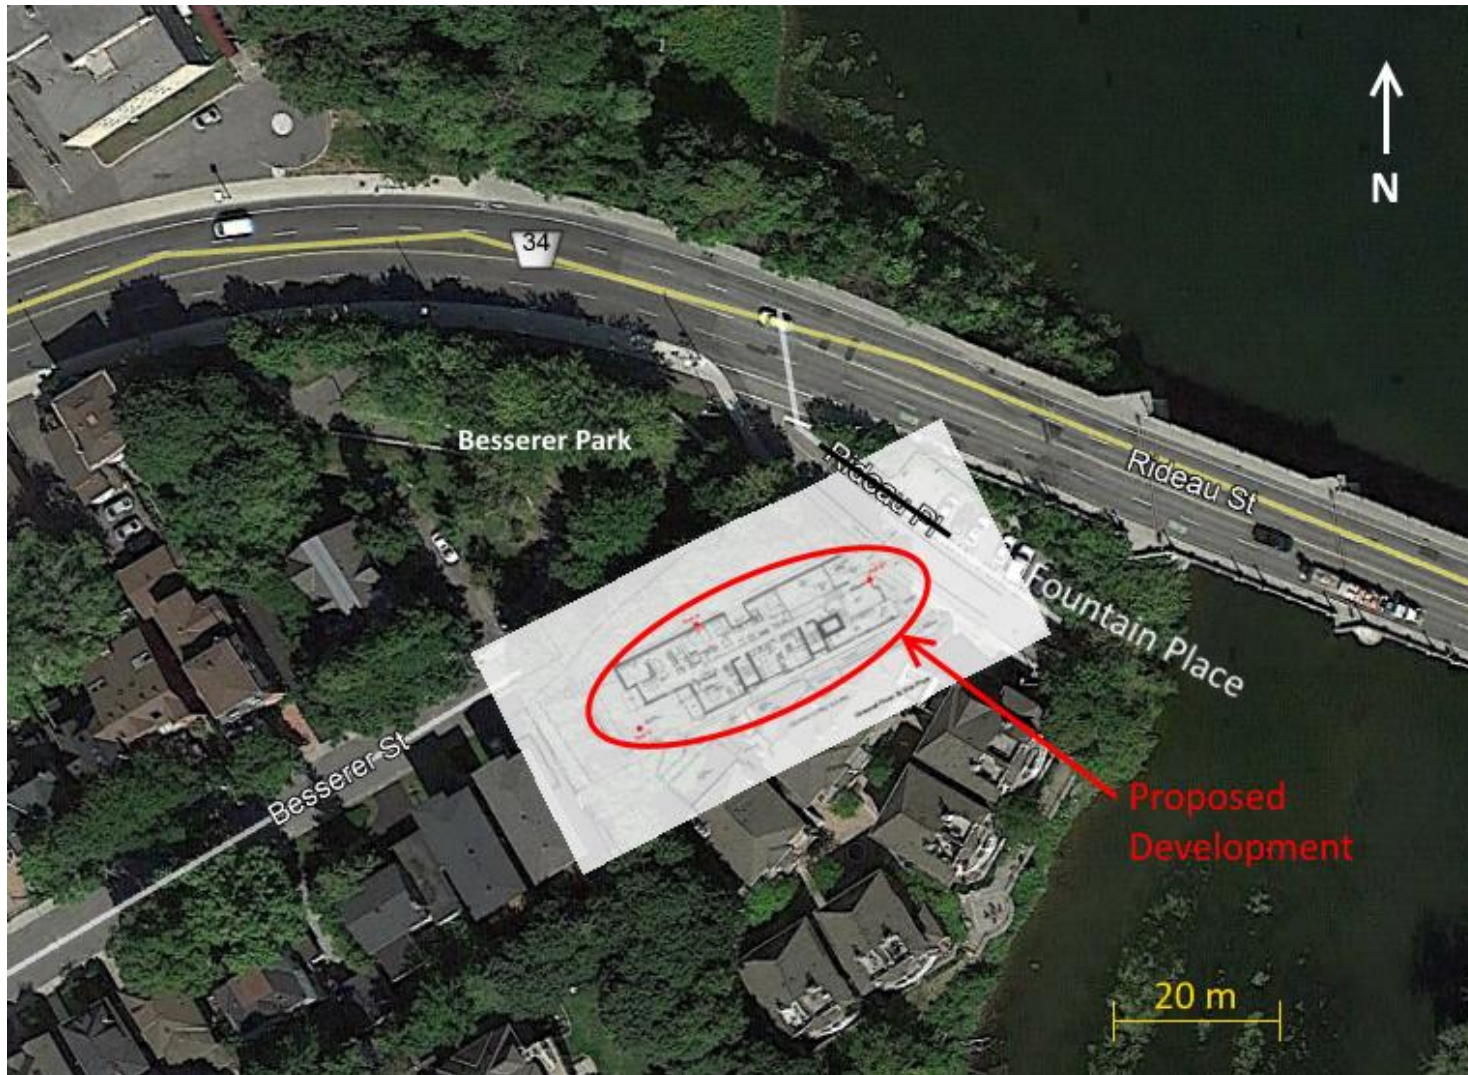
Site plan overlaid onto GoogleEarth, showing the immediate surrounding area.
